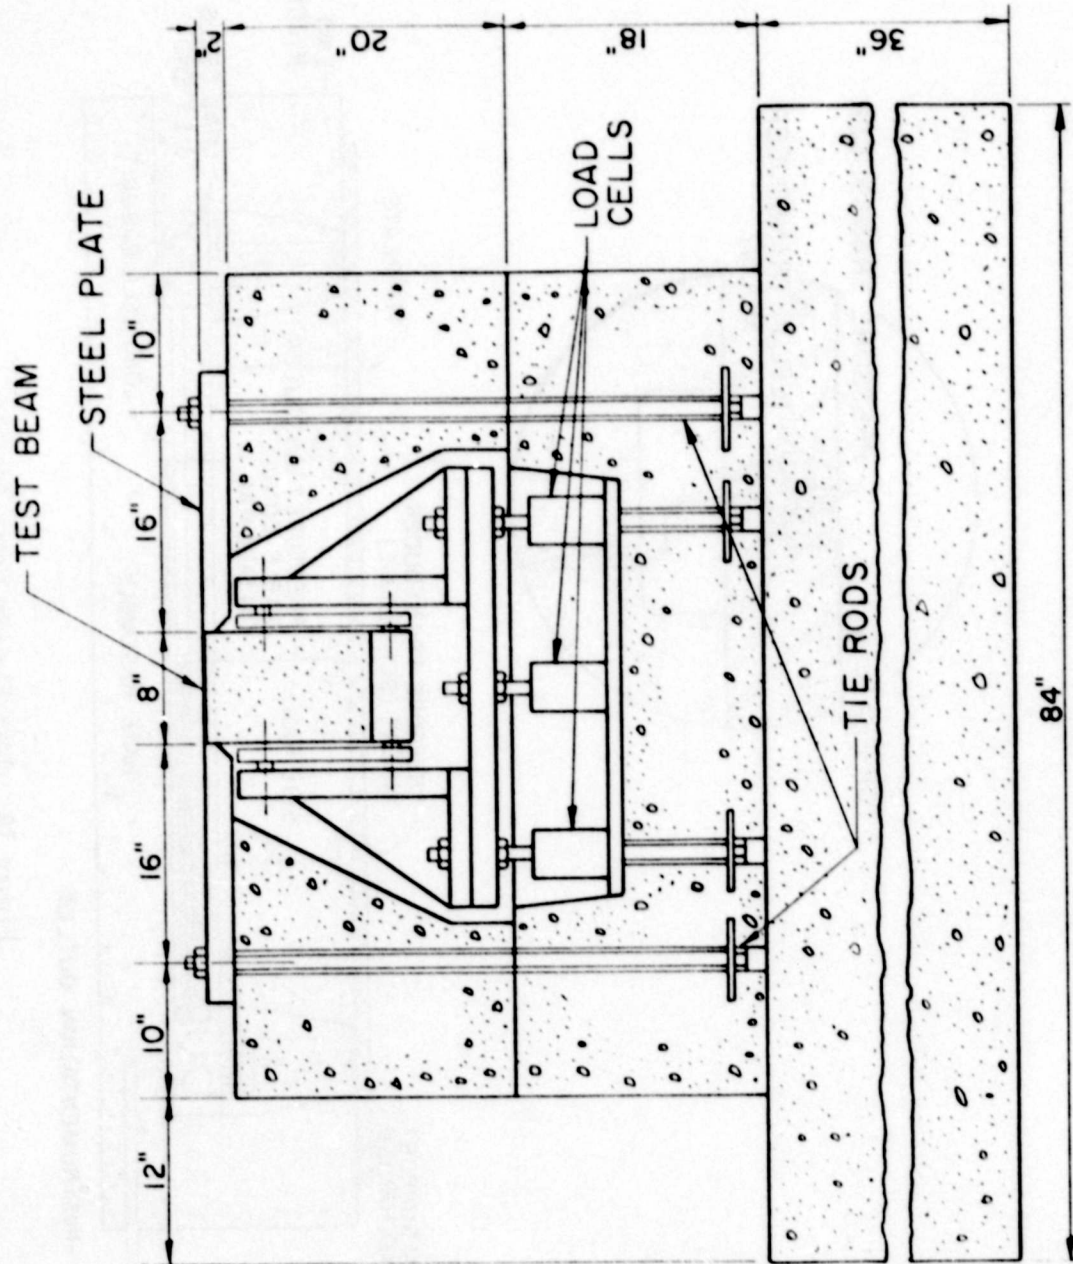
Cross Section Through End of Test Fixture With Top Plates, Beam Support Mechanism, and Load Cells in Place
